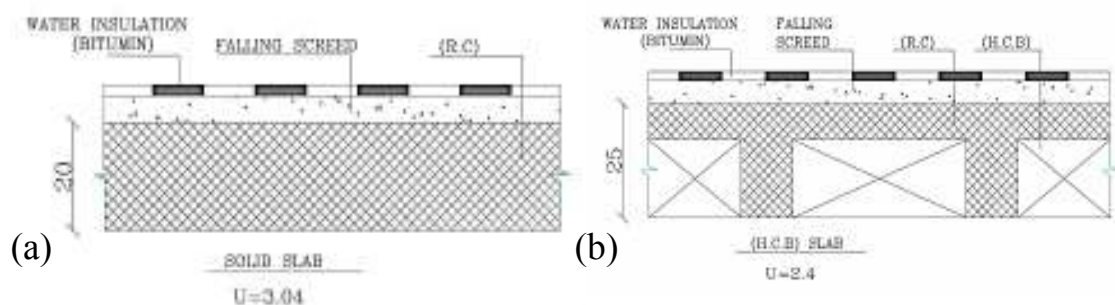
(a) A section in a solid concrete slab, (b) A section in a ribbed concrete slab.
